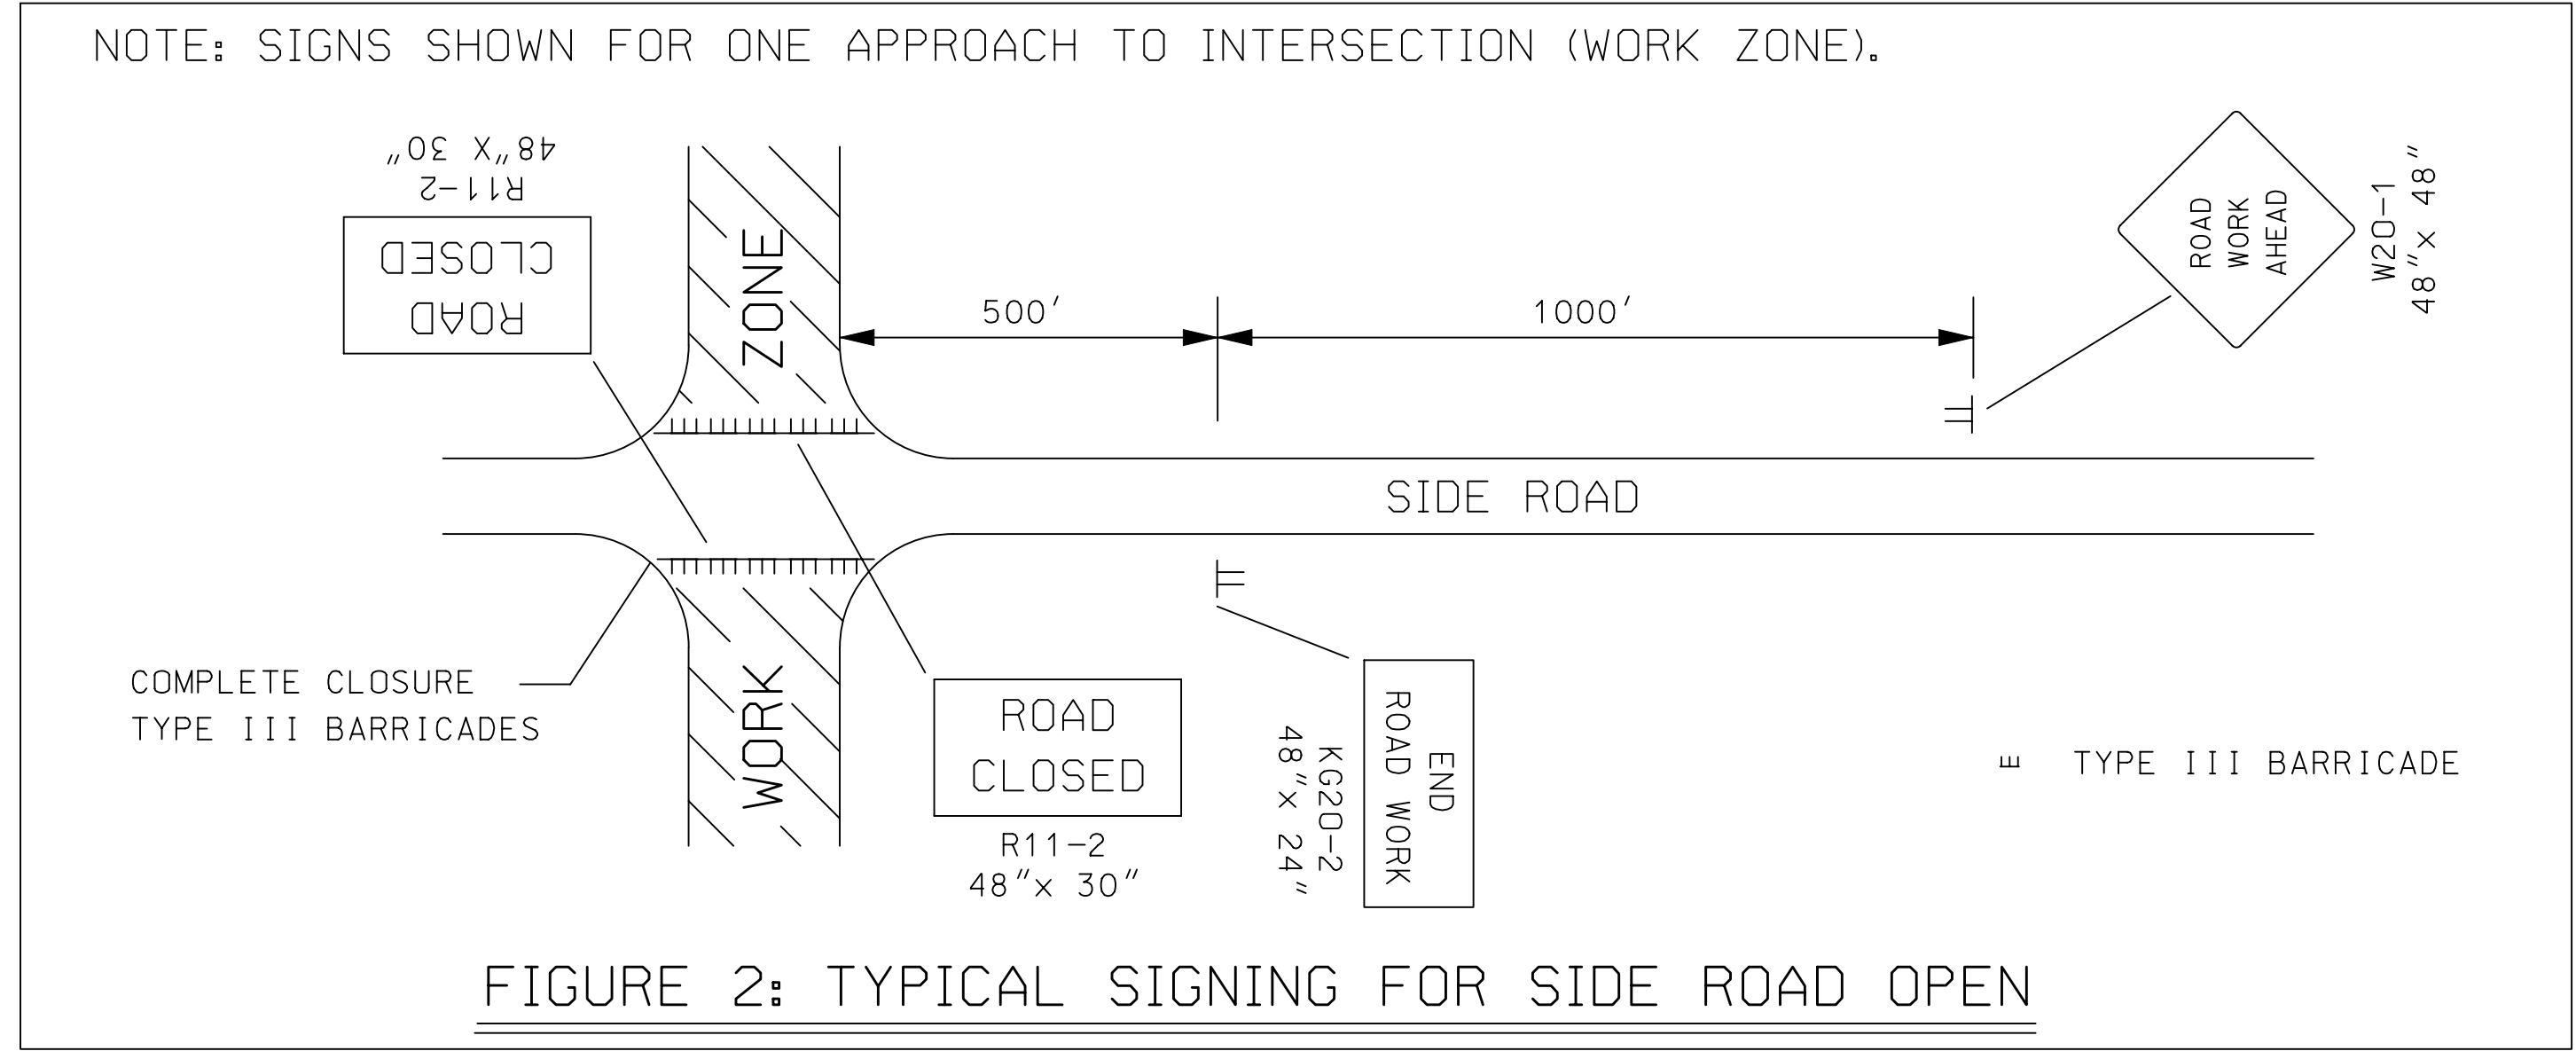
TYPICAL SIGNING FOR SIDE ROAD OPEN
